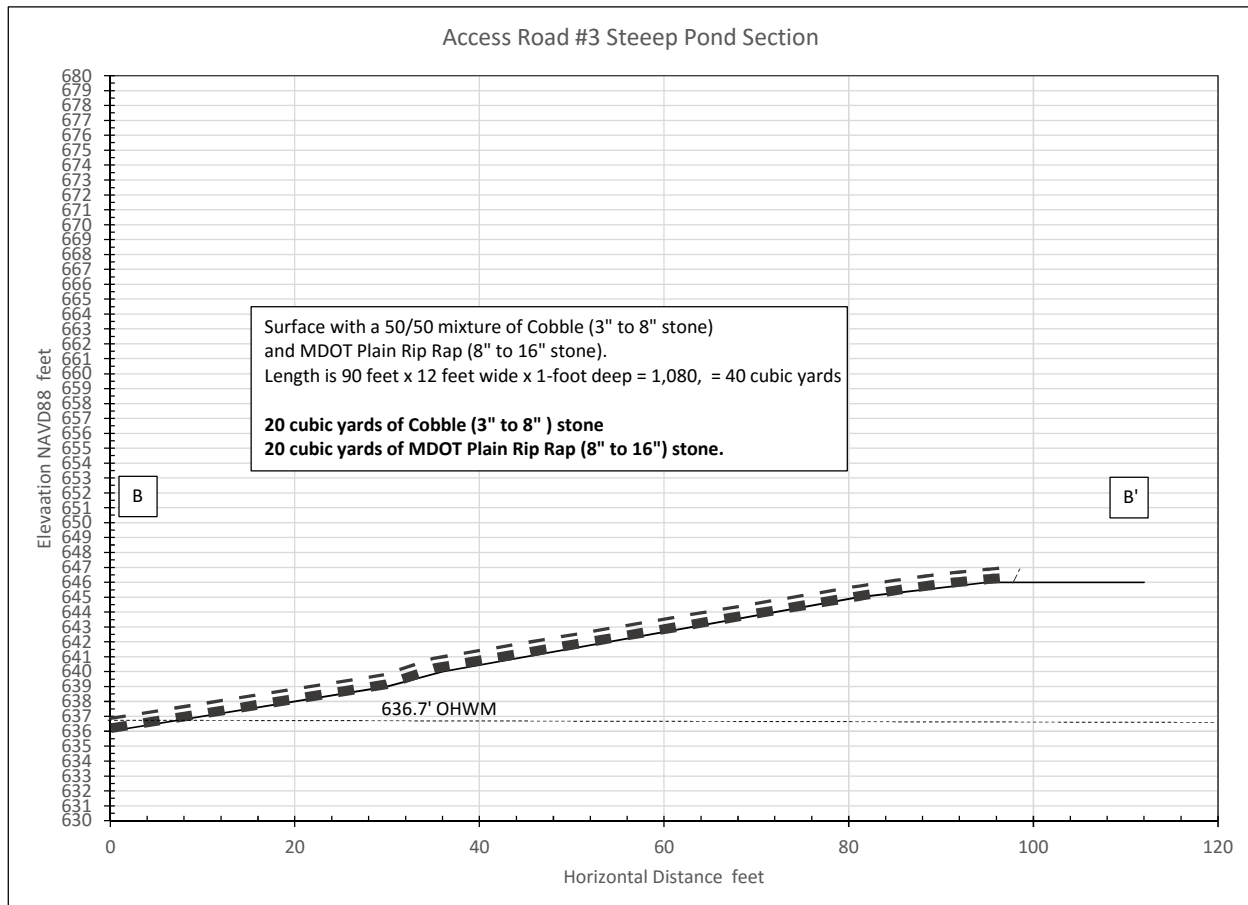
Access Road #3 steep segment entering the raceway pond. This is longitudinal section B-B'.
